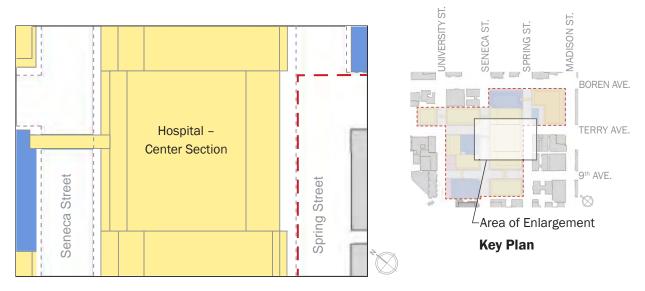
Proposed Building Setbacks – Central Hospital Block – Center Section
